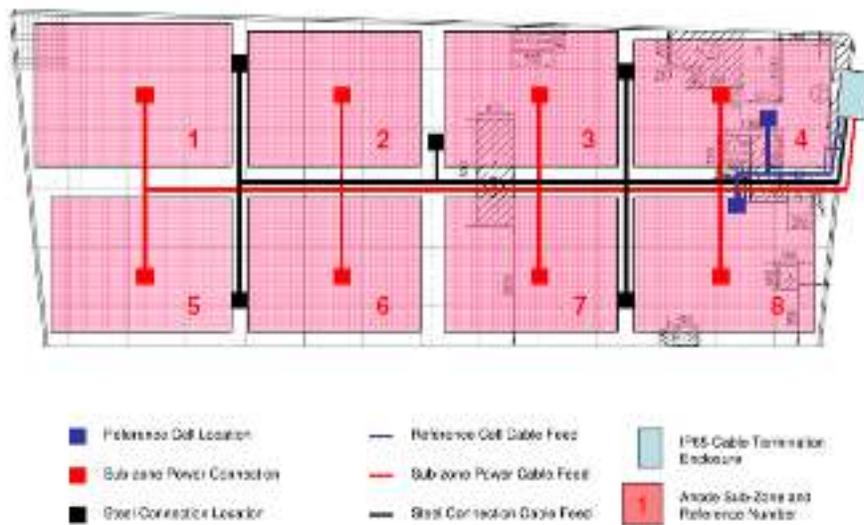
Arrangement of hybrid anode zones, steel connections and reference cell locations
